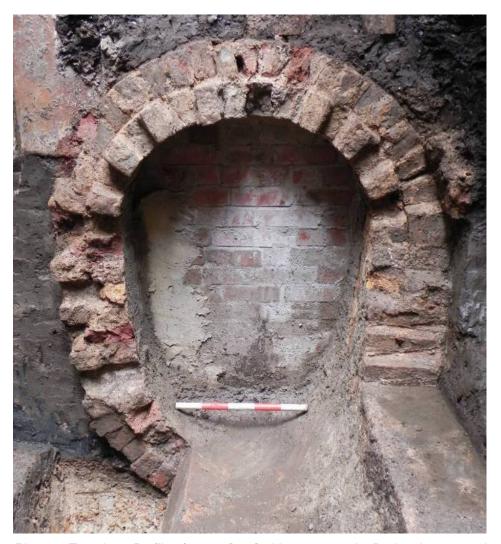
Trench 1 - Profile of sewer [535] with a 0.5m scale. During the excavation it was backfilled and bricked up westward, and largely broken out within the trench (looking west).
